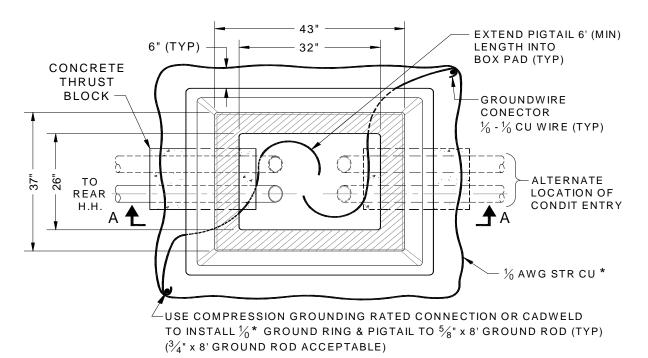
Typical Fiberglass box Pad Installation Details to support Single Phase Transformers
